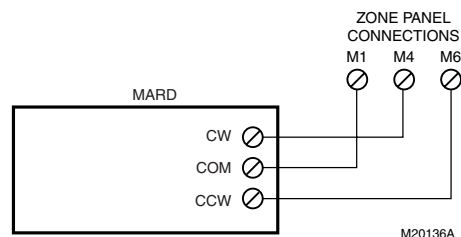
Wiring MARD Damper or ML6161 Actuator to panel.
